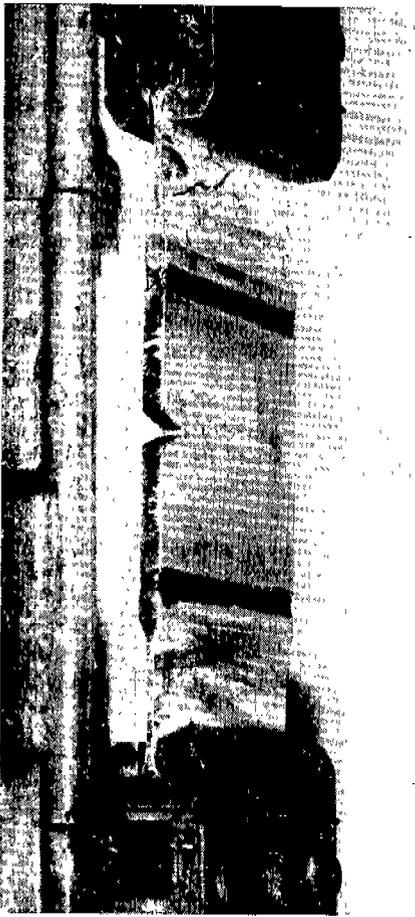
Plate in testing machine showing plastic hinges and dovetailing T-heads
